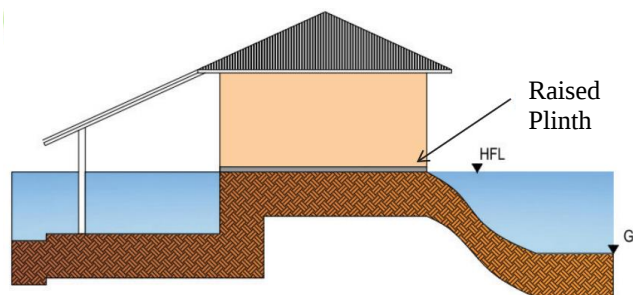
Plinth Level Raised by Creating an Elevated Ground [61]
